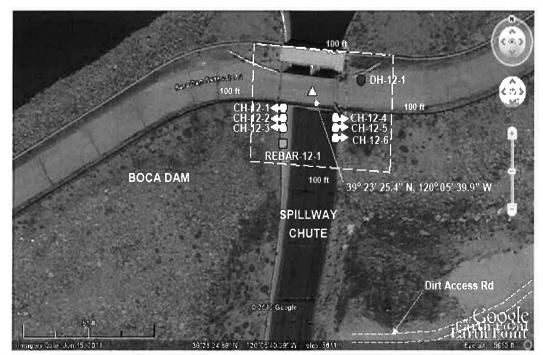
LOCATIONS OF PROPOSED DRILL HOLE, CONCRETE CORE HOLES AND REBAR SAMPLE BOCA DAM SAFETY OF DAMS INVESTIGATIONS
